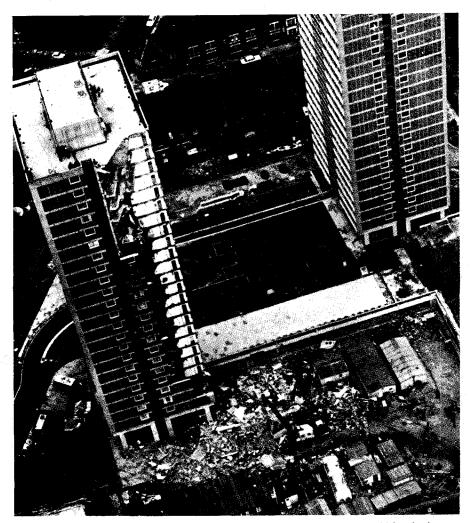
Ronan Point Apartment Building after collapse, with a second identical building in background. (Courtesy: London Express News and Feature Services.)
